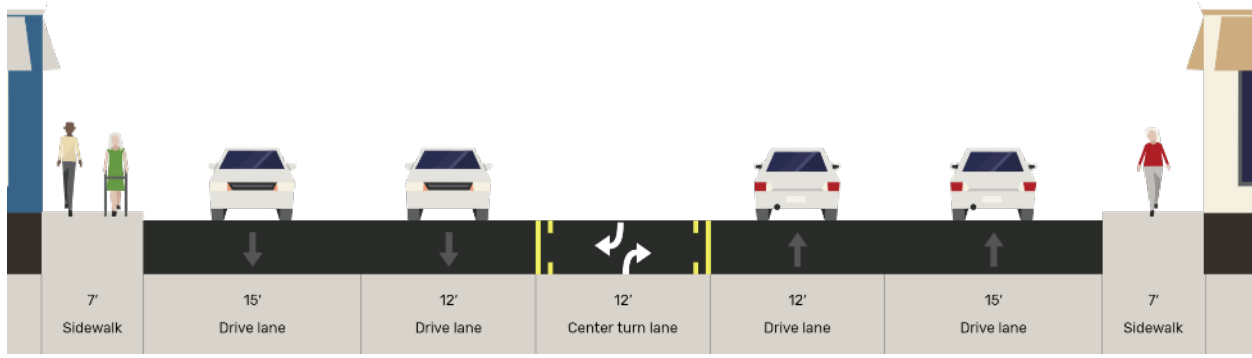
U.S. 101 Cross Section – Four Travel Lanes (80-foot right-of-way)
